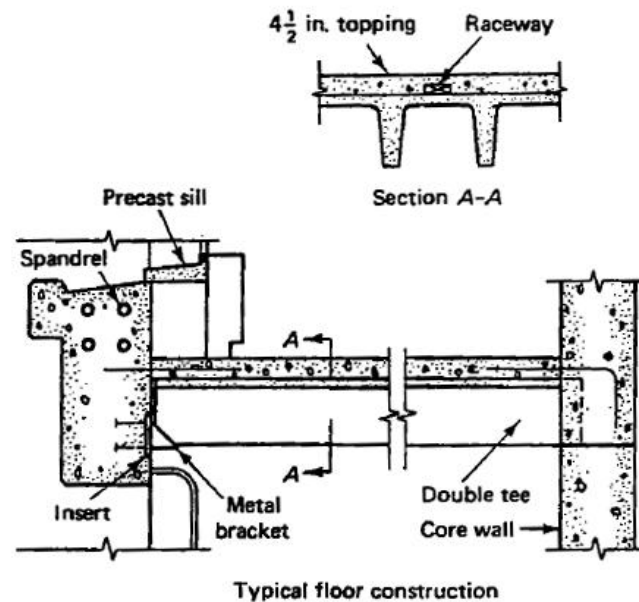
Construction method and typical joint details in Gulf Life Prestressed Building, Jacksonville, Florida.
